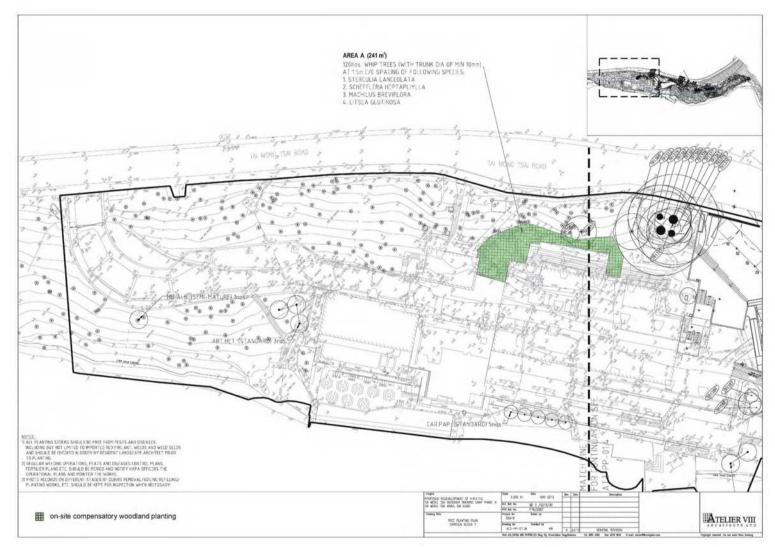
On-Site Compensatory Woodland Planting Plan - Schedule of Drawings
